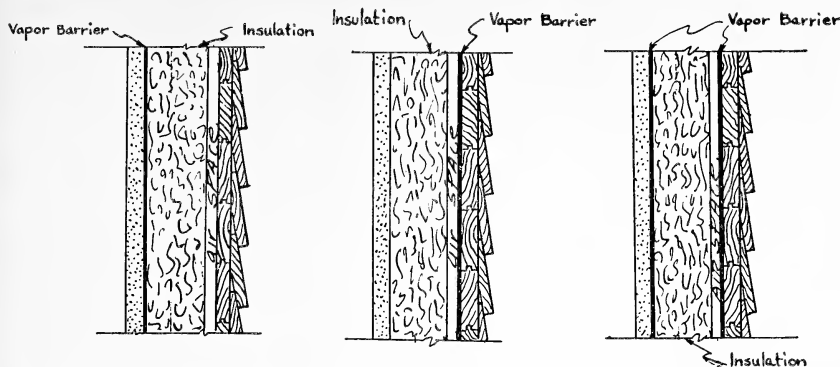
LEFT: *Insulating for Heating Only.* A vapor barrier on the inside of the wall is essential to prevent migration of moisture into insulation from occupied rooms. An additional ventilating air space is a supplementary precaution.
